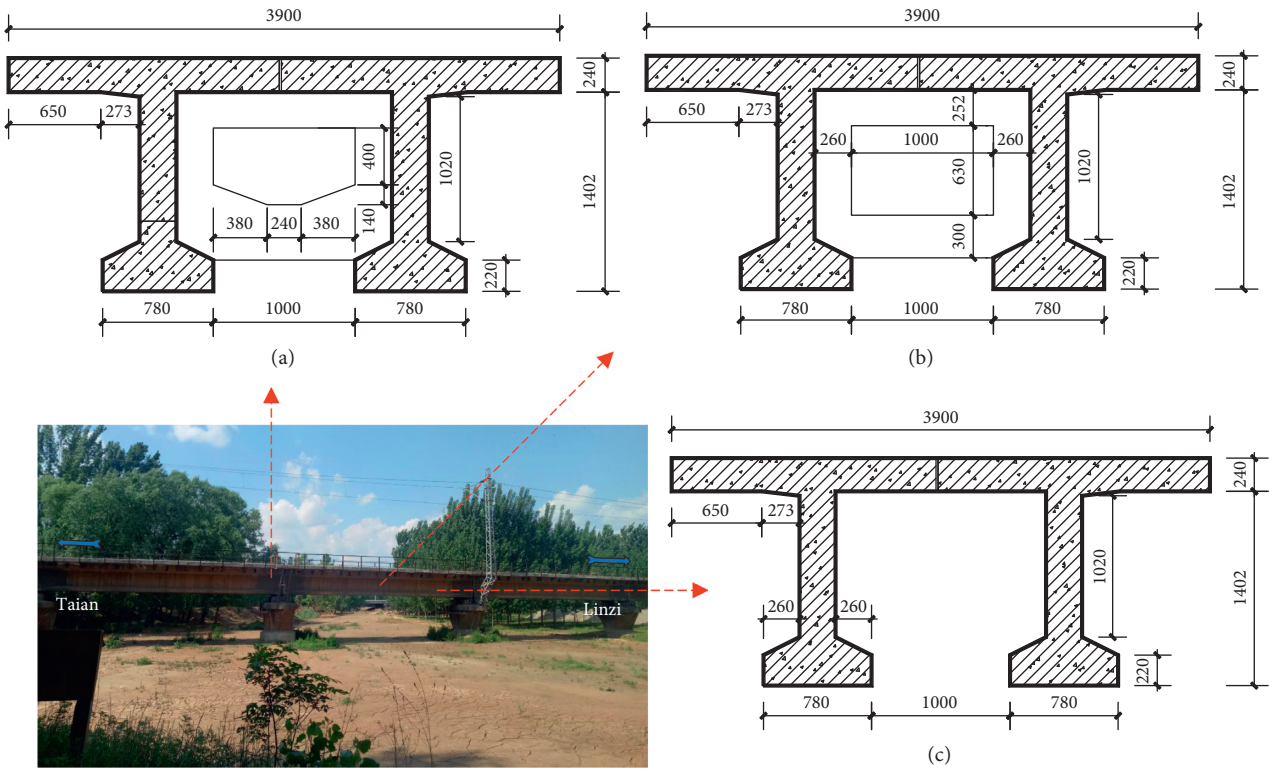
Xin-Tai Railway NO.40 bridge and side elevation of the bridge (units: mm). (a) Support cross section, (b) 1/2 and 1/4 cross section, and (c) another cross section.
